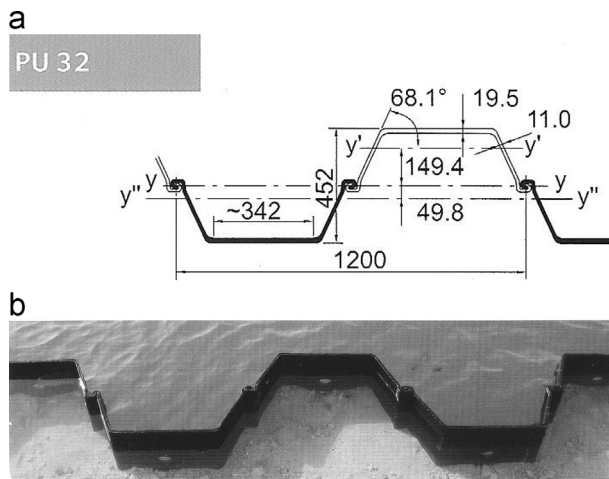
Sheet pile wall made of PU 32 section: scheme and plan view of driven piles.
